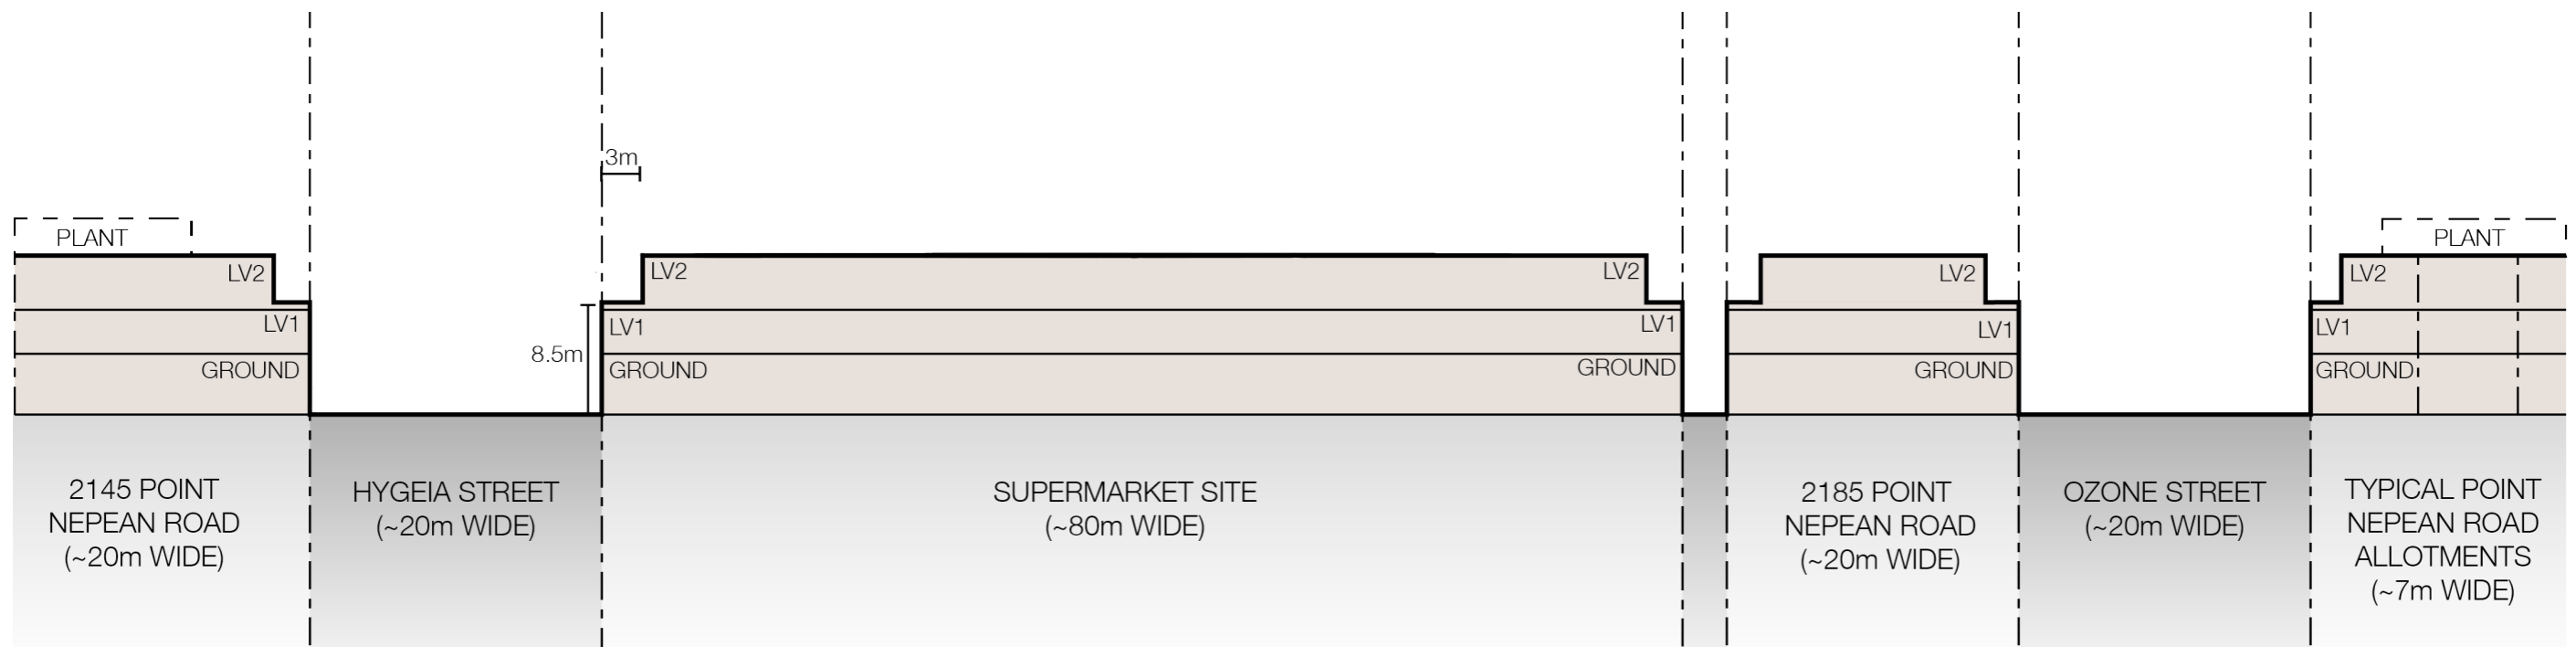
Extrapolated section diagram of recommended massing to Point Nepean Road side streets.
